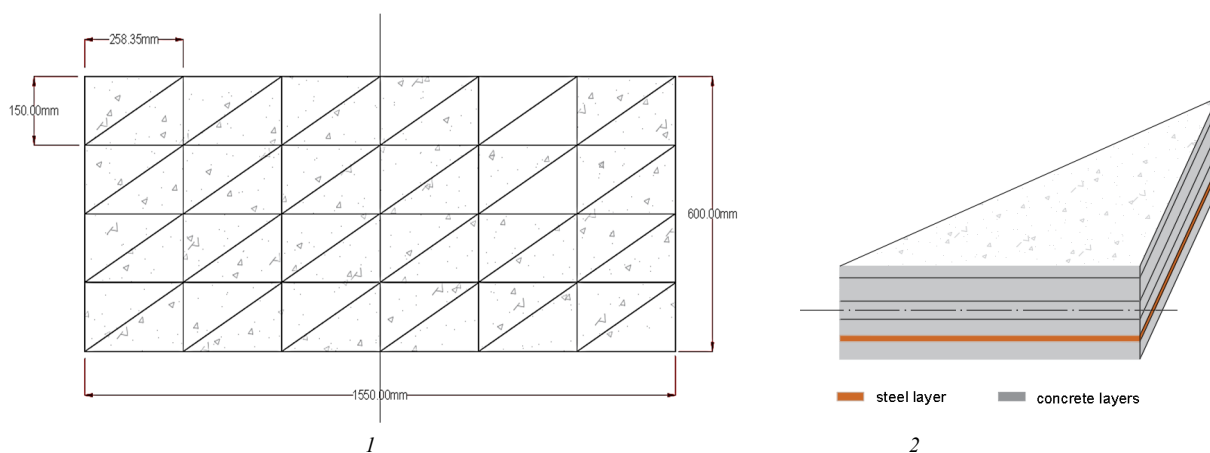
FE mesh of semi precast of reinforced concrete slab with topping concrete
